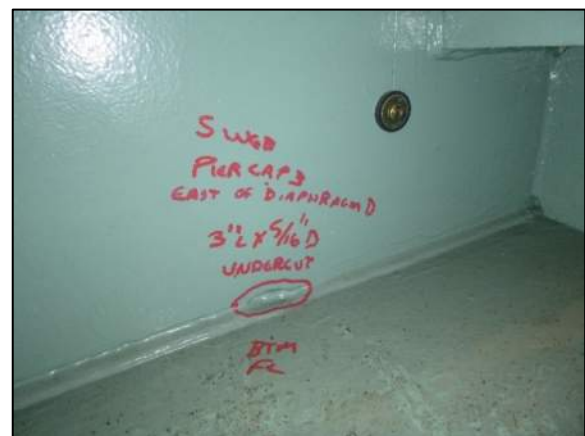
3" L Undercut at South Web and Bottom Flange Interface, East of Girder D
